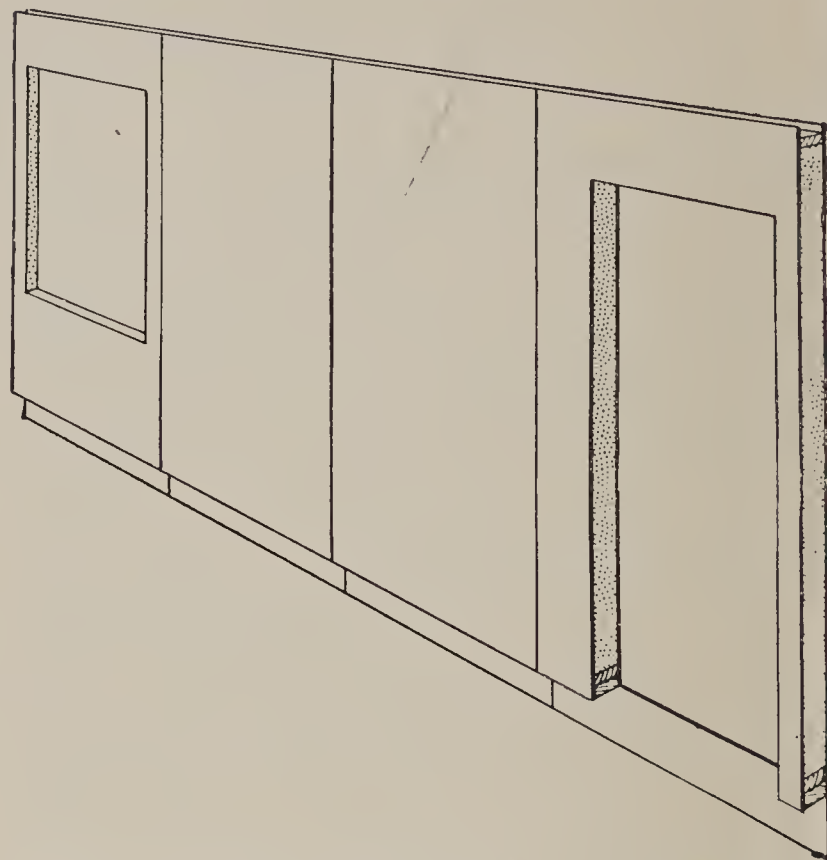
Room-length section of stressed-cover construction, showing door and window openings.
